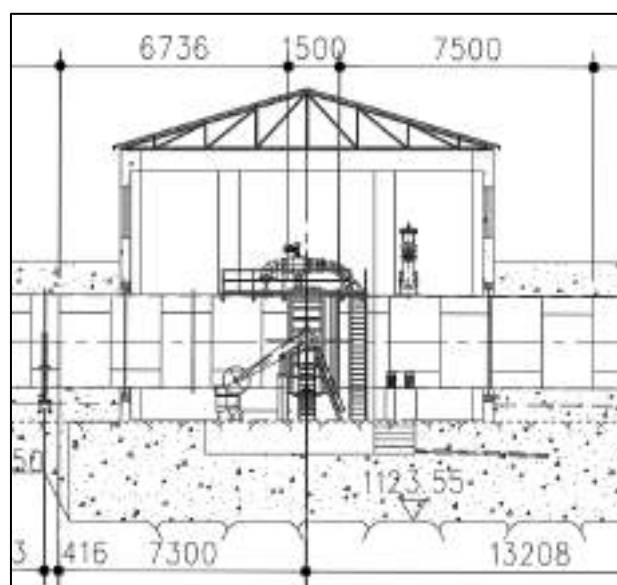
Emergency Butterfly Valve after Surge Tank 2/2
